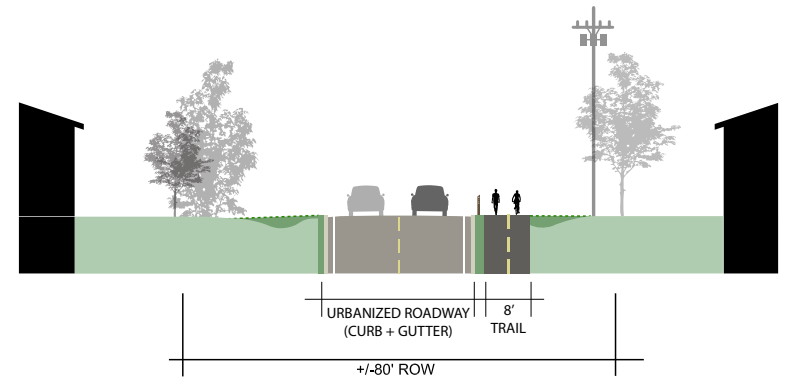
Proposed Trail on Manitowoc Road (south side shown; to be determined which side of roadway in final design)
